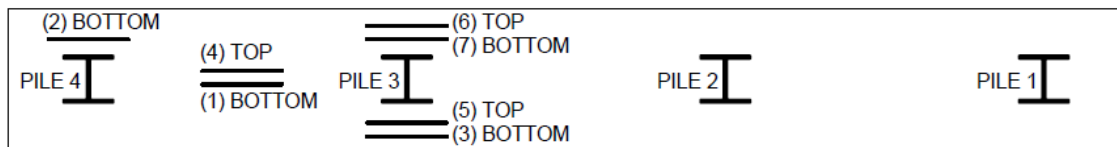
Concrete Encasement Instrumentation Layout Facing Old Town Creek
